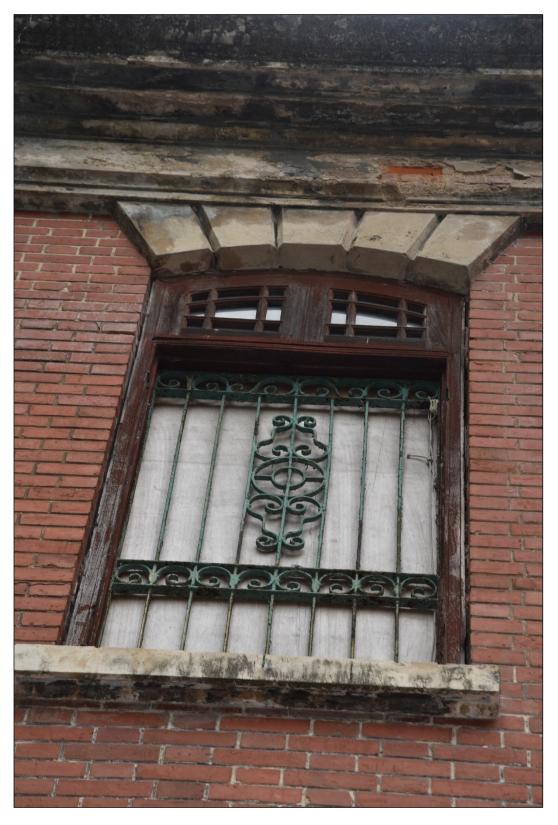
North-east elevation (front elevation), first floor, window Wdw-1f04, external side, covered with plywood, (21st March, 2023)
